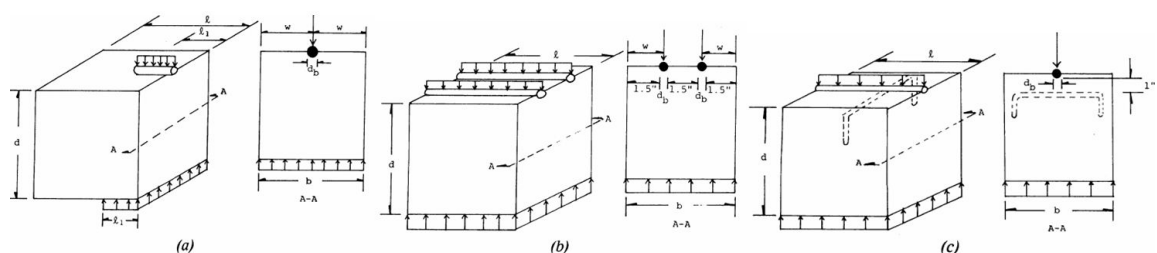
Test specimens: a) general geometry, b) multiple-bar specimen, and c) confined specimen (Soroushian *et al.*, 1986)
